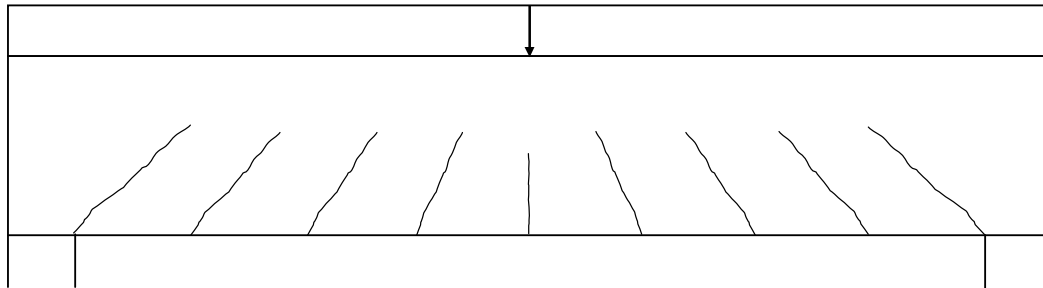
Cracking pattern of a simply supported reinforced concrete beam under uniformly distributed load.
